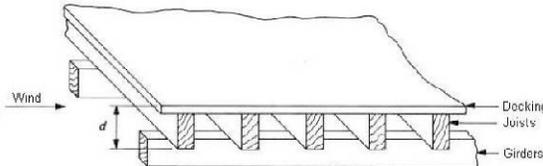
Case 2: wind parallel to girders
